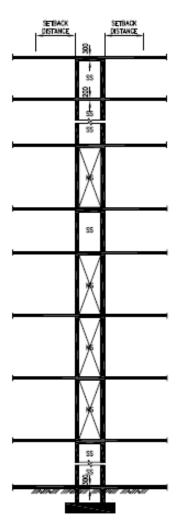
D - Section – Storey Shelters And Non Shelters In Storey Shelter Tower
